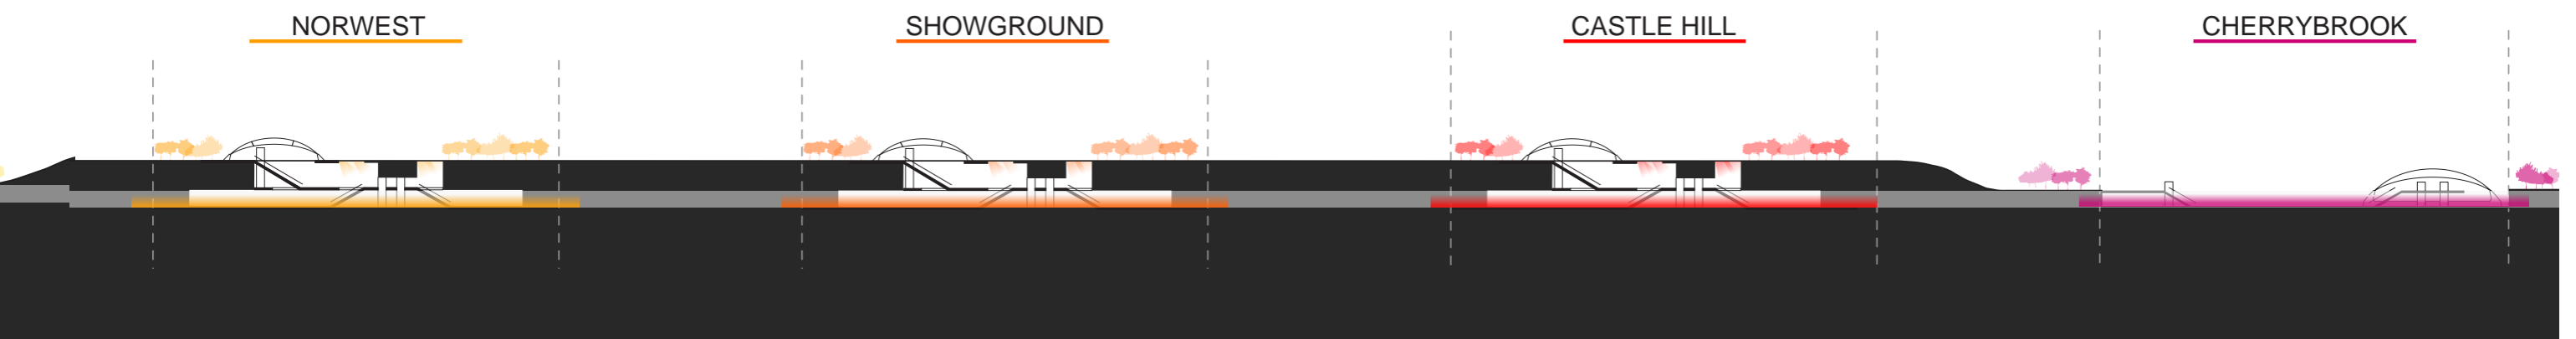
Line Wide Public Art Plan Sections for Station Precincts illustrating Light Line Concept . Source: MWA with T+C Studio.
